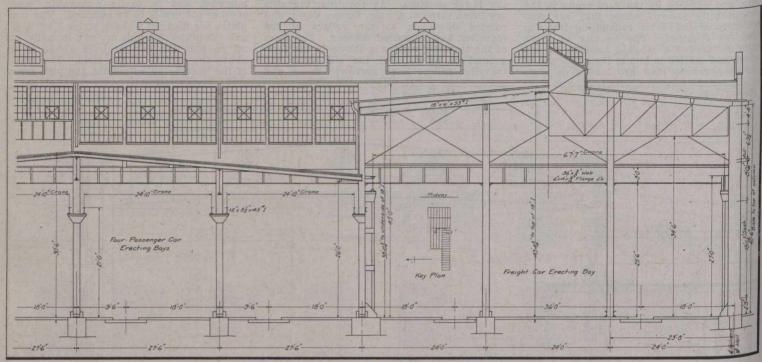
Cross section through Passenger and Freight Car Erection Sections.
